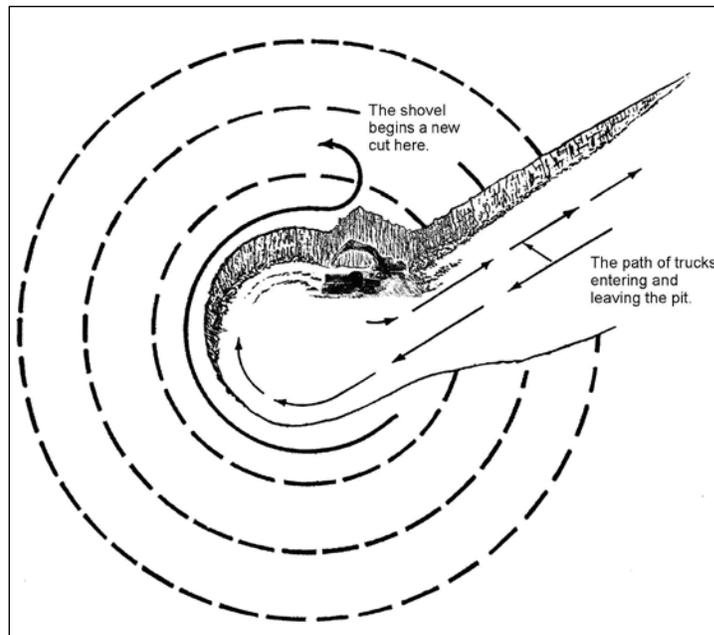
Layout and development of a subsurface pit using the circular-bench method
